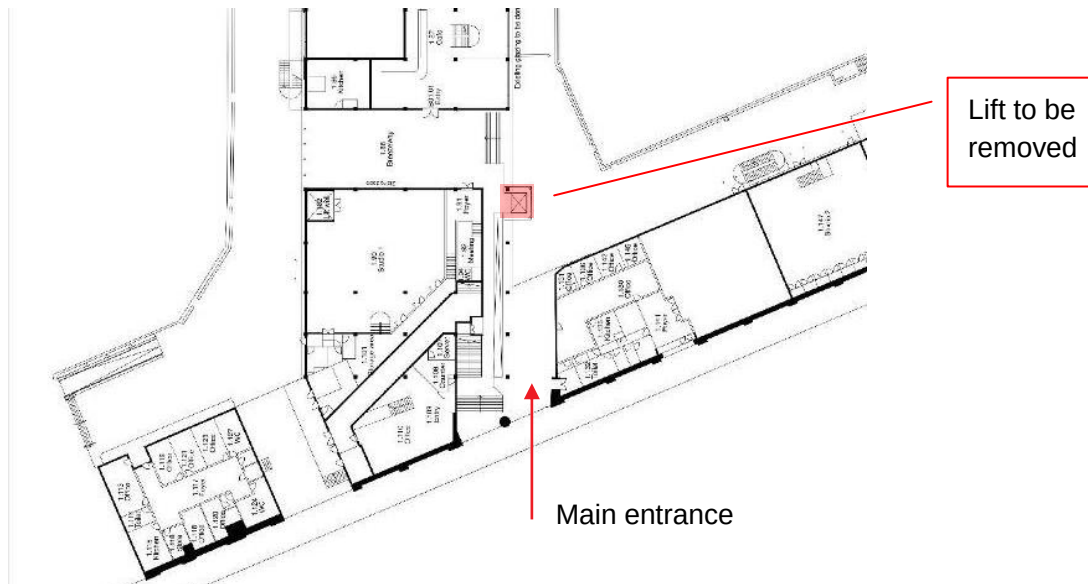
Plans showing the lift that will be relocated, Pier 4/5.
